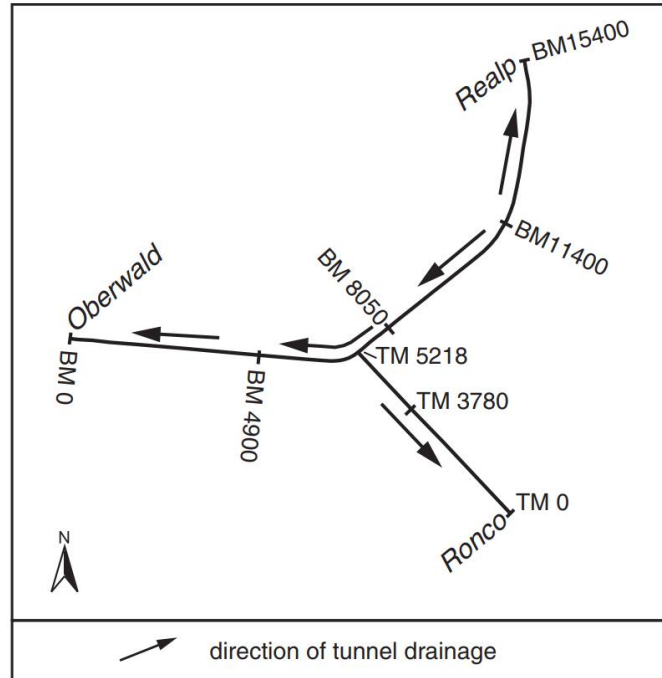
Trace of drainage in the Furka tunnel and Bedretto adit (Ofterdinger et al., 2014)
